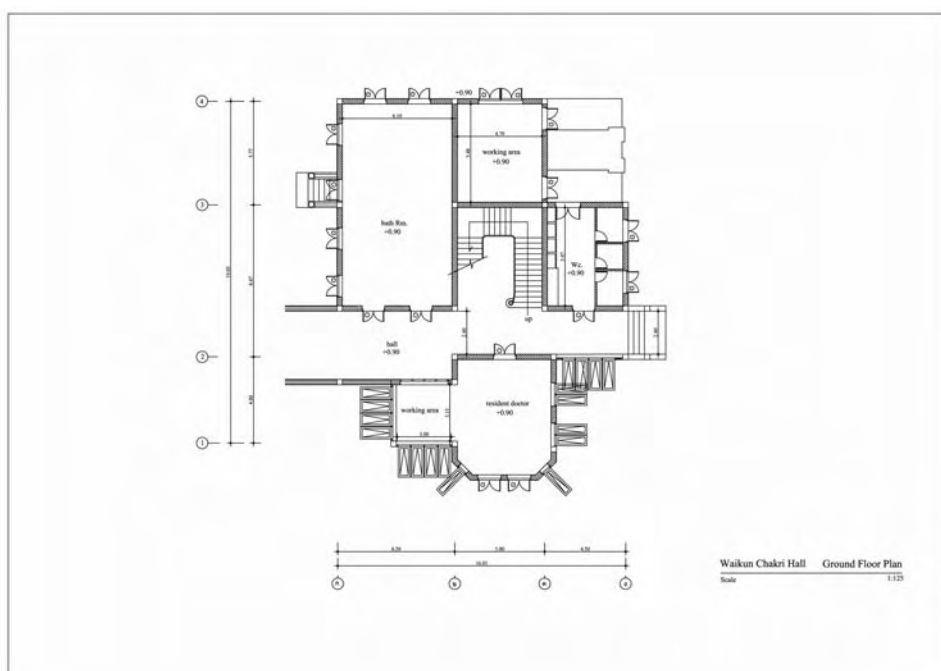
Ground floor plan of Waikun Thepayasthan Hall
